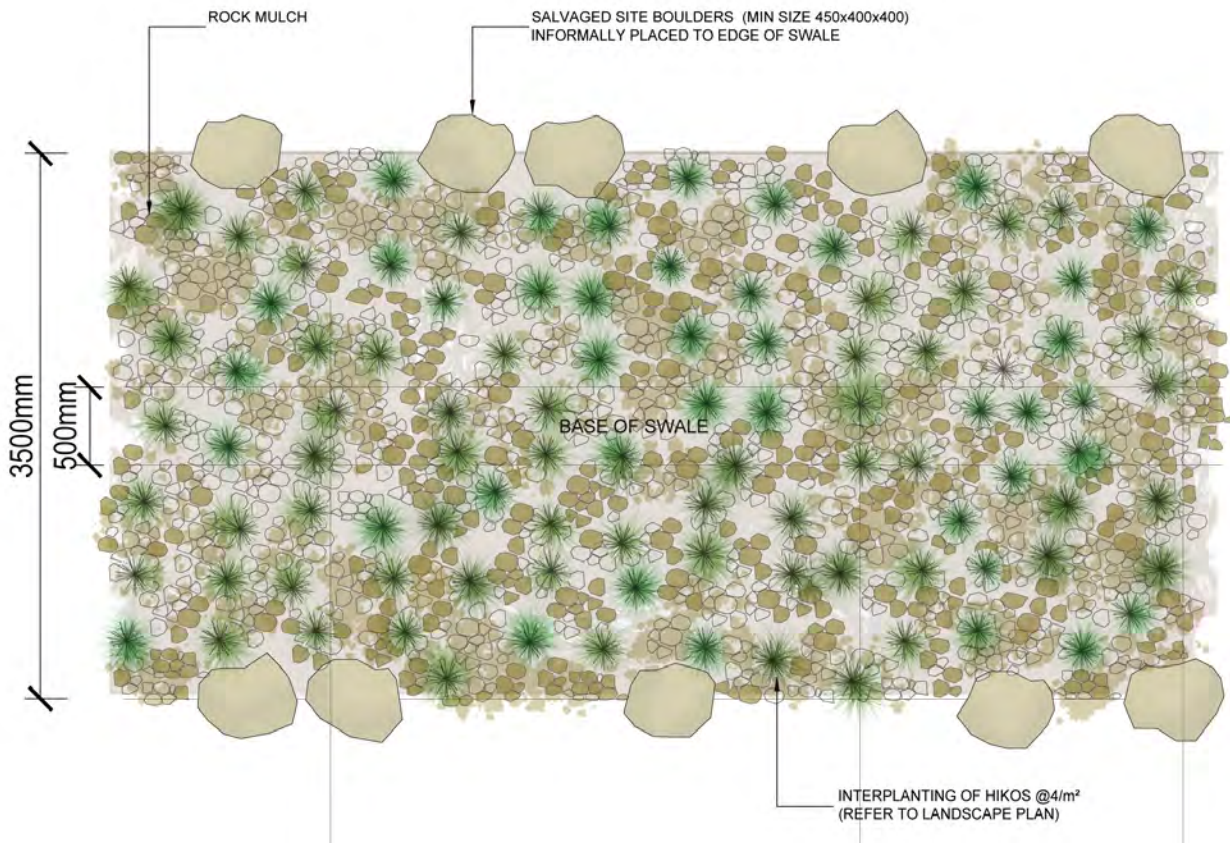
Plan of a rock mulch swale-interplanted with wetland filter plants
